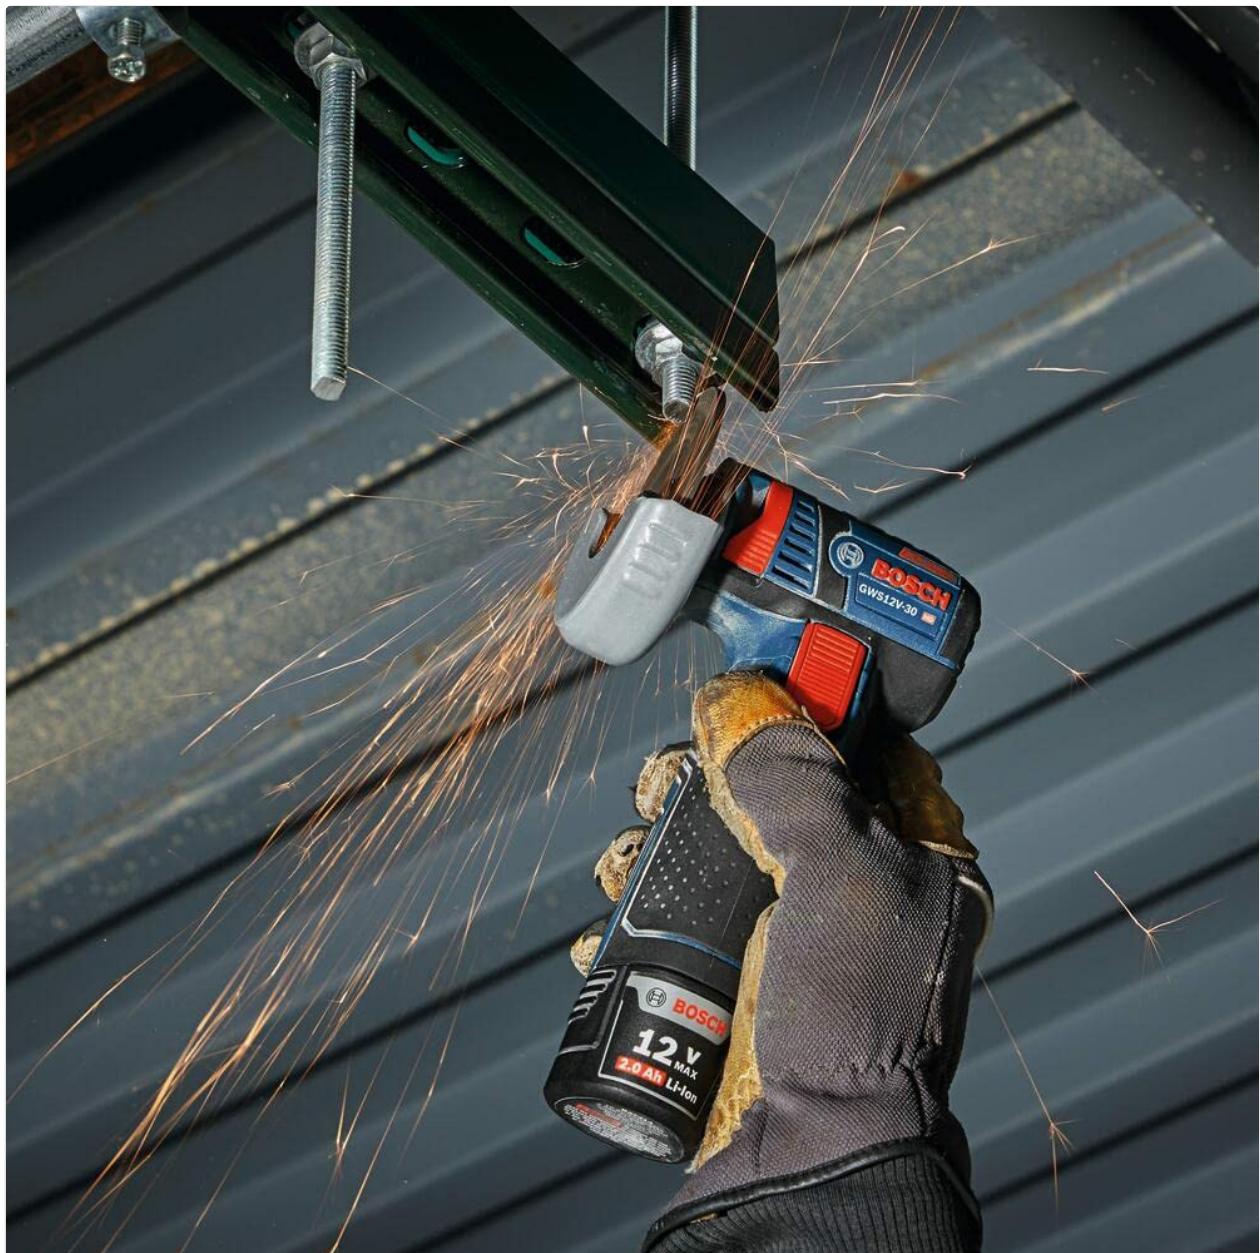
A detailed view of the Bosch CMW300 multi-wheel precisely cutting a threaded rod, highlighting its cutting efficiency.
